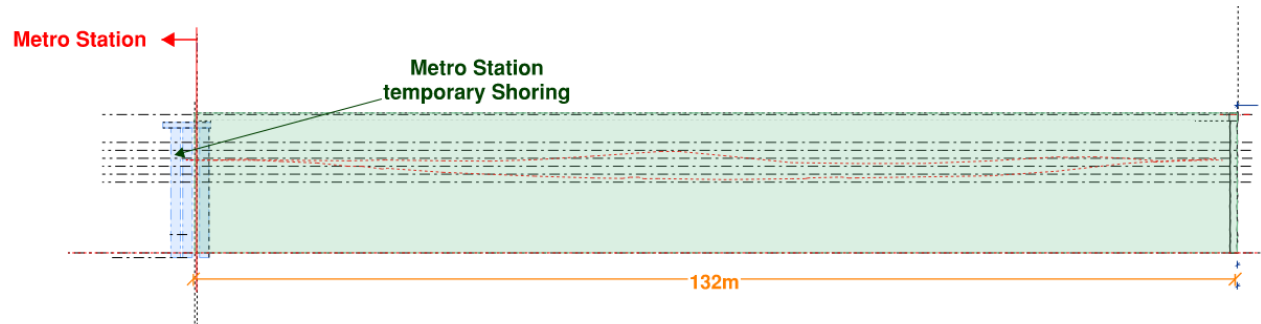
Elevation of Shoring Wall Along Hickson Road
